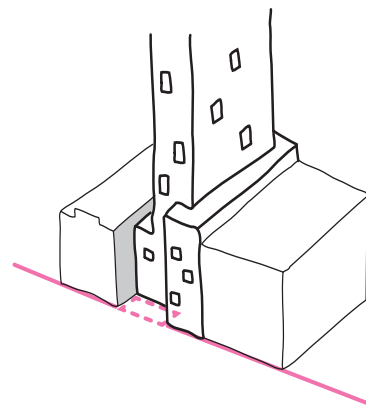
The new development aligns to the street to provide a continuous and well-defined street edge.
